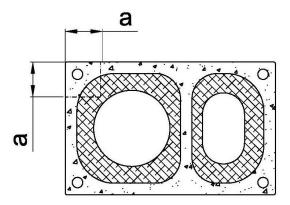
Example of test specimen location of side-by-side air flue chimneys
